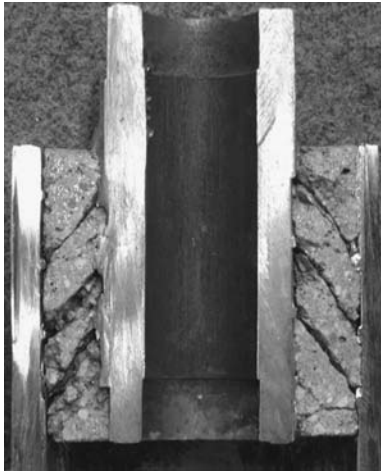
A test to prove the formation of struts in the concrete [137]
